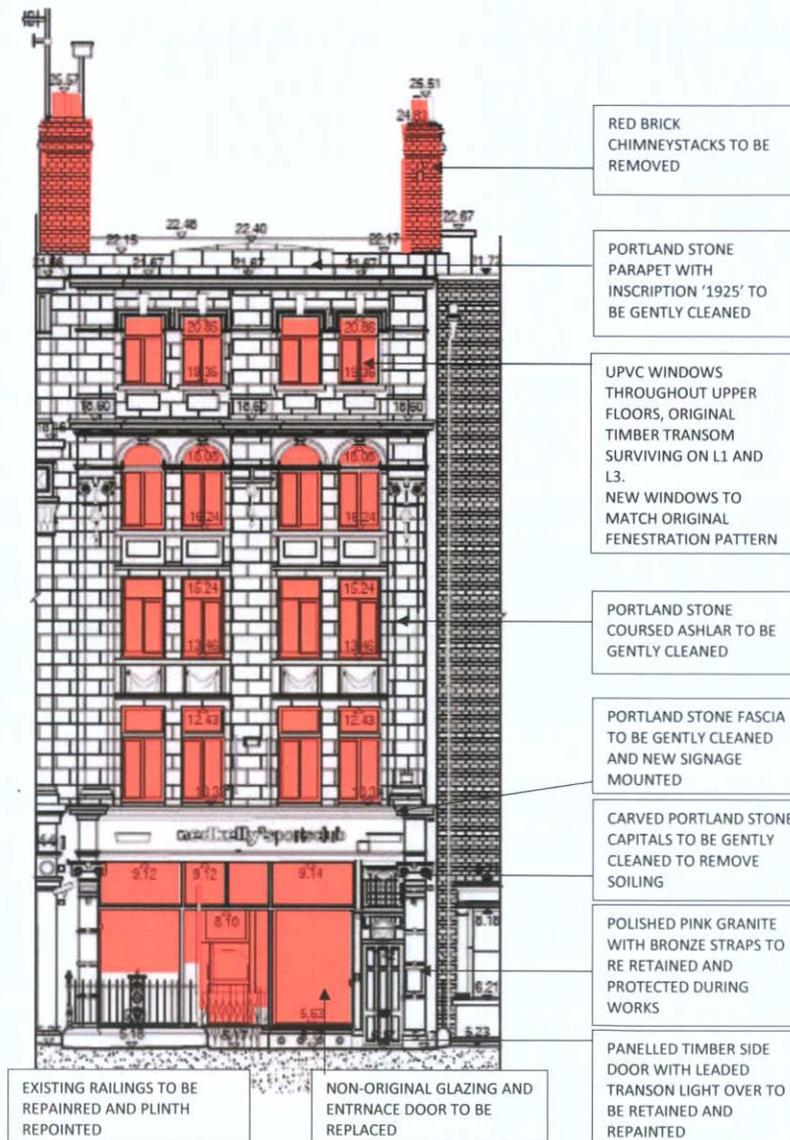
No.43 O’Connell Street Upper. Note: Elevations with fabric proposed to be removed highlighted. These survey drawings are based on a dimension survey carried out by Murphy Surveyors in 2020. Not to scale. The drawings within this report are for illustrative purposes only and are not to scale. Please refer to detailed drawings submitted with the application for accurate dimensions and information.
